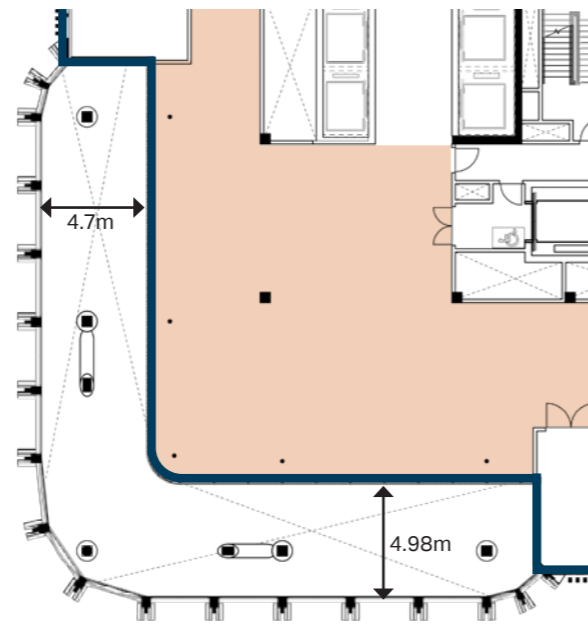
floor plan showing indicative office workspace with double-height amenity terrace
